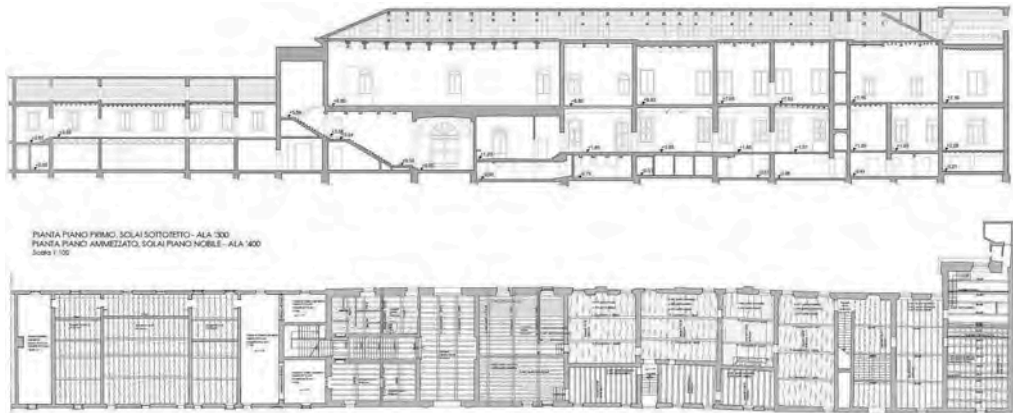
Survey: section and floor plan of the main floor structure of Palazzo Schifanoia before the restoration site works were carried out.
